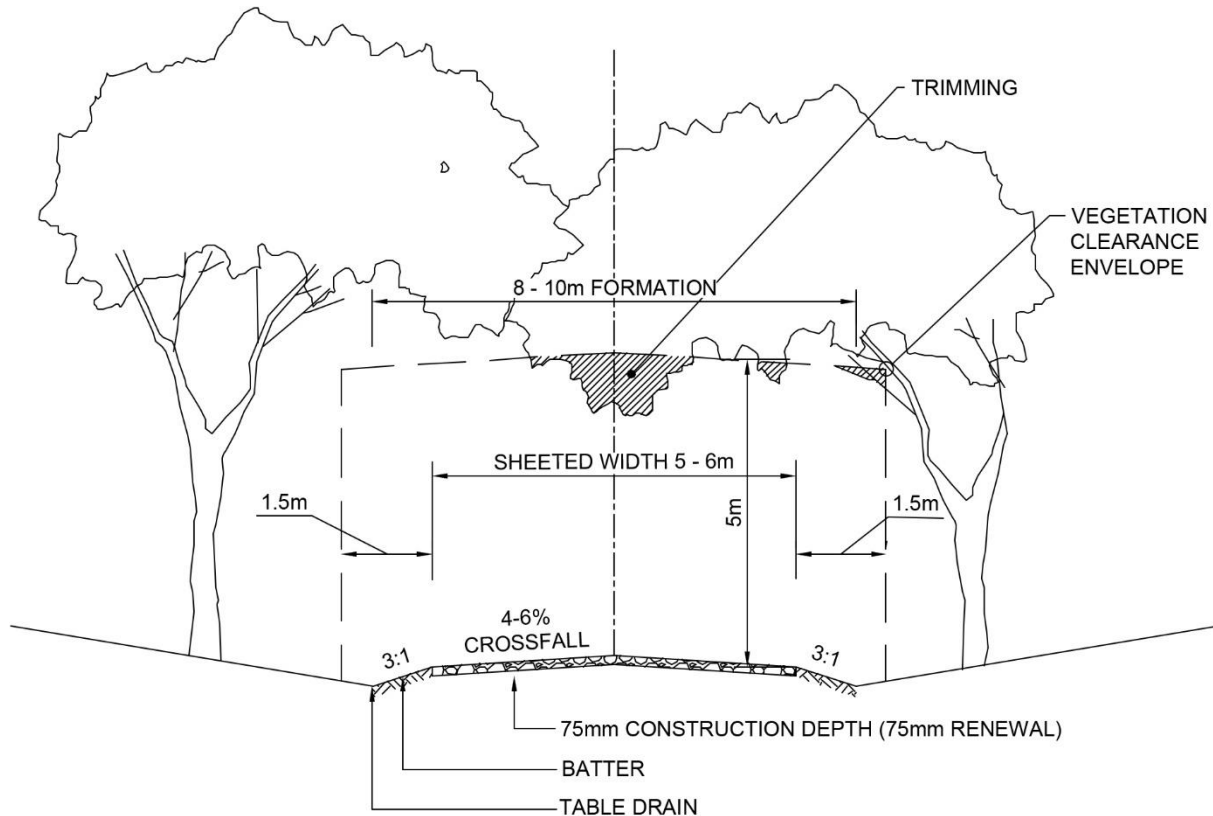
Rural Sheeted Category 5 Construction Cross Section
